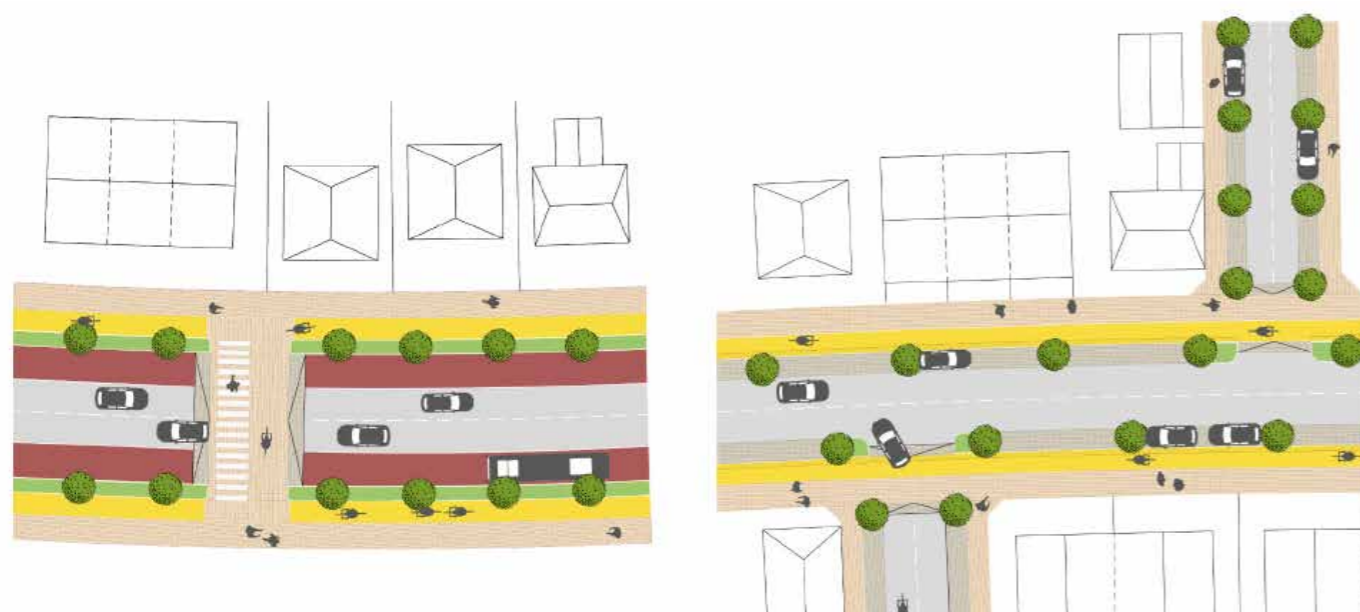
Avenue street plans from Healthy Streets for Surrey Design Guide
